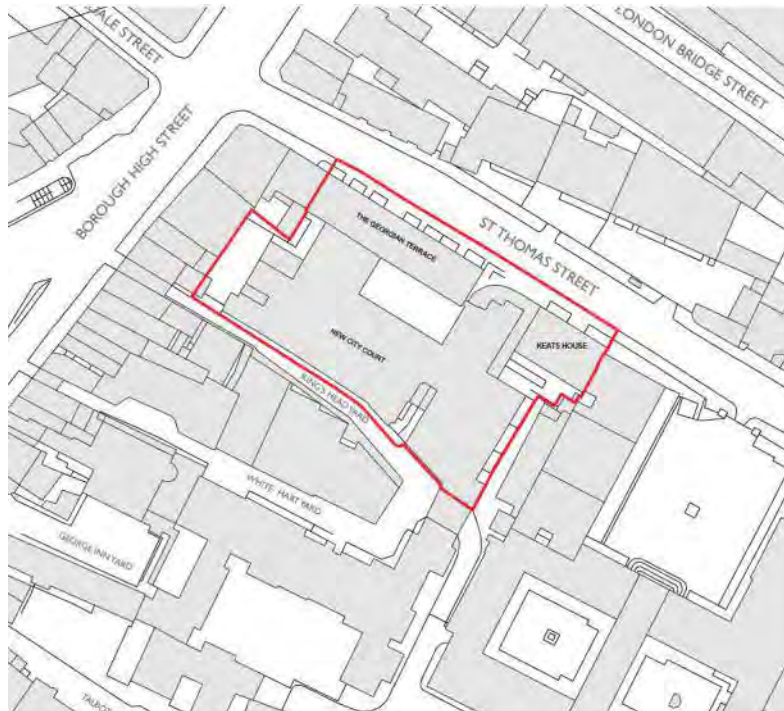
Existing Buildings and Red Line Planning Application Boundary.
